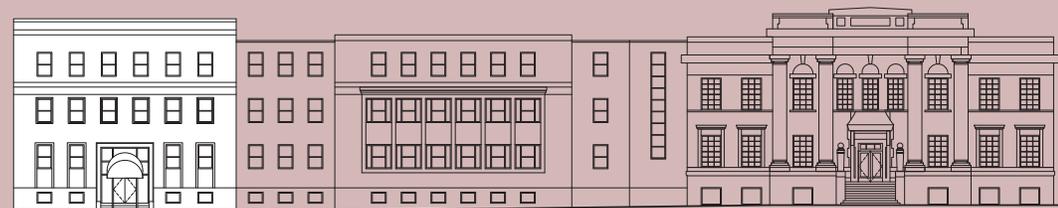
\_ North Elevation, Facade shown as of 2020
